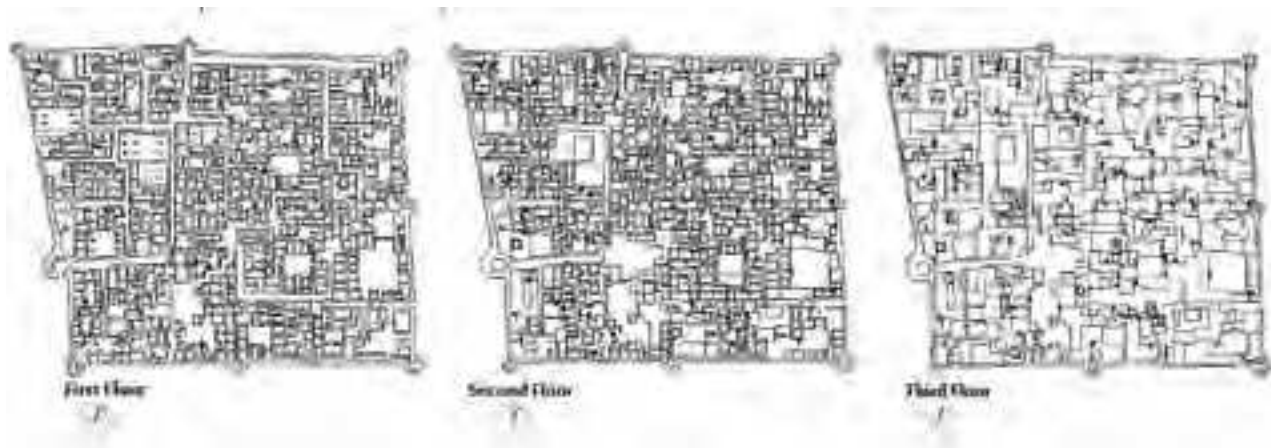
Floor plans of the historic site of Moorcheh Khort (credits: Renovation Company for Moorcheh Khort Historical Fortress, 2008)
